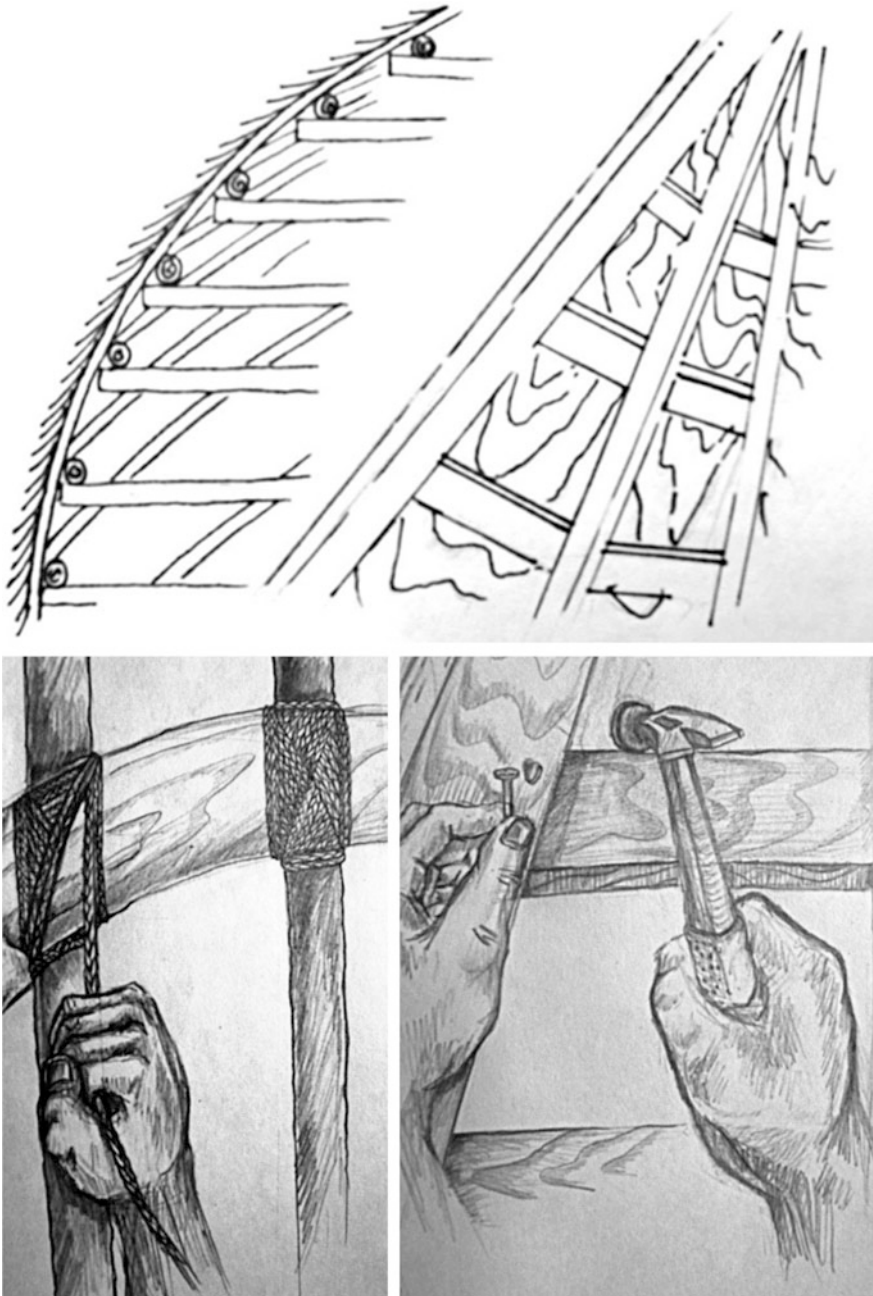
Contrasting traditional convex roof form using the arching purlins (*vaega fau*) and *laau matua* (left) with straight sloping milled lumber rafter construction (right) (Drawings: Henry Utoaluga)
